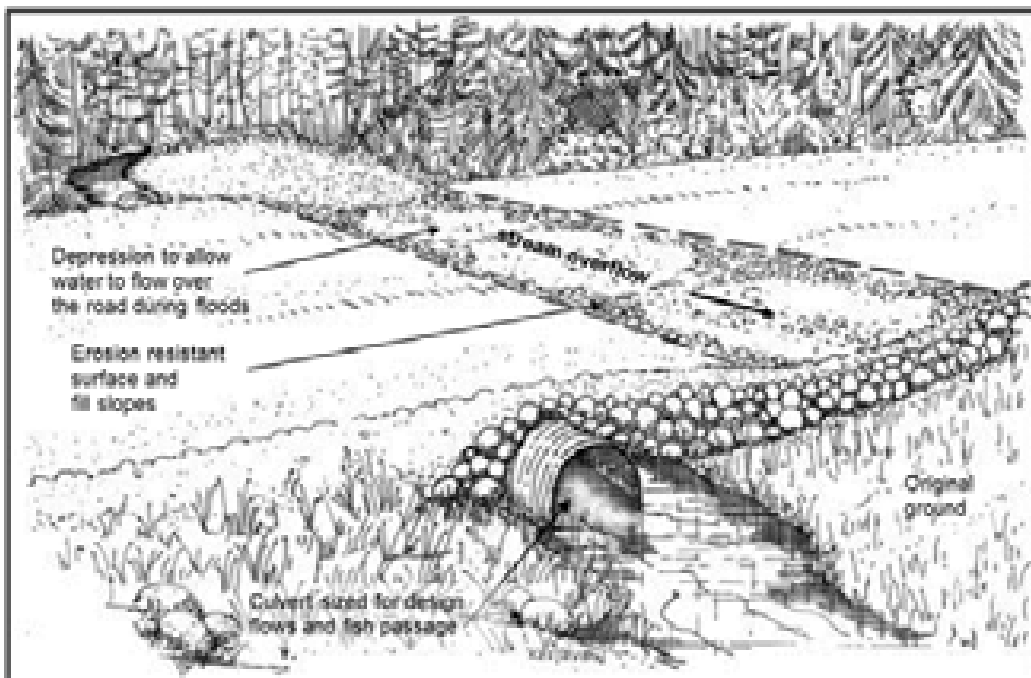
A depression beside the culvert allows water to spill over the road in the event of a flood or culvert blockage (illustration by Kestevan Design).
